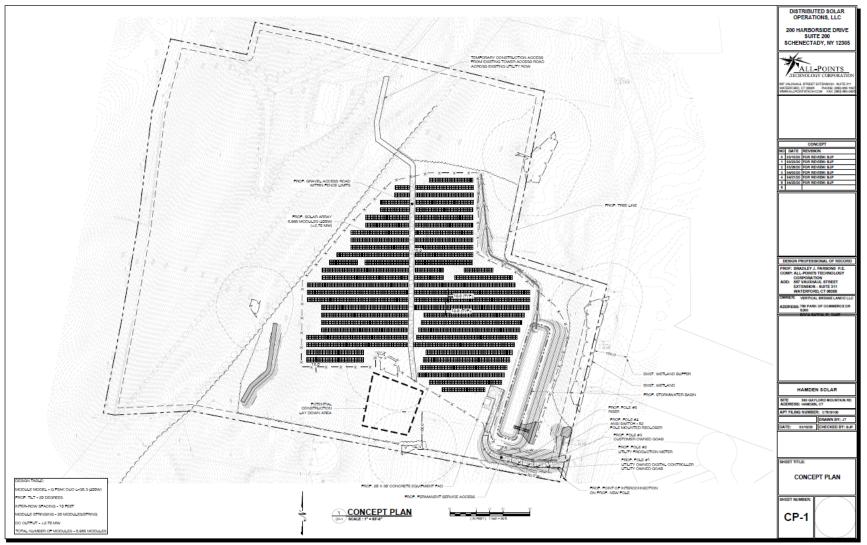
Project plans showing the proposed solar center in Hamden, Connecticut.
